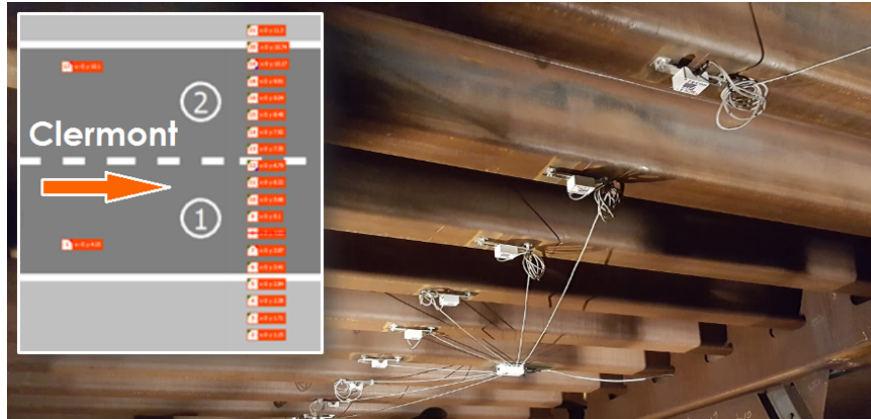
BWIM system, scheme and photo inside the deck of the viaduct
